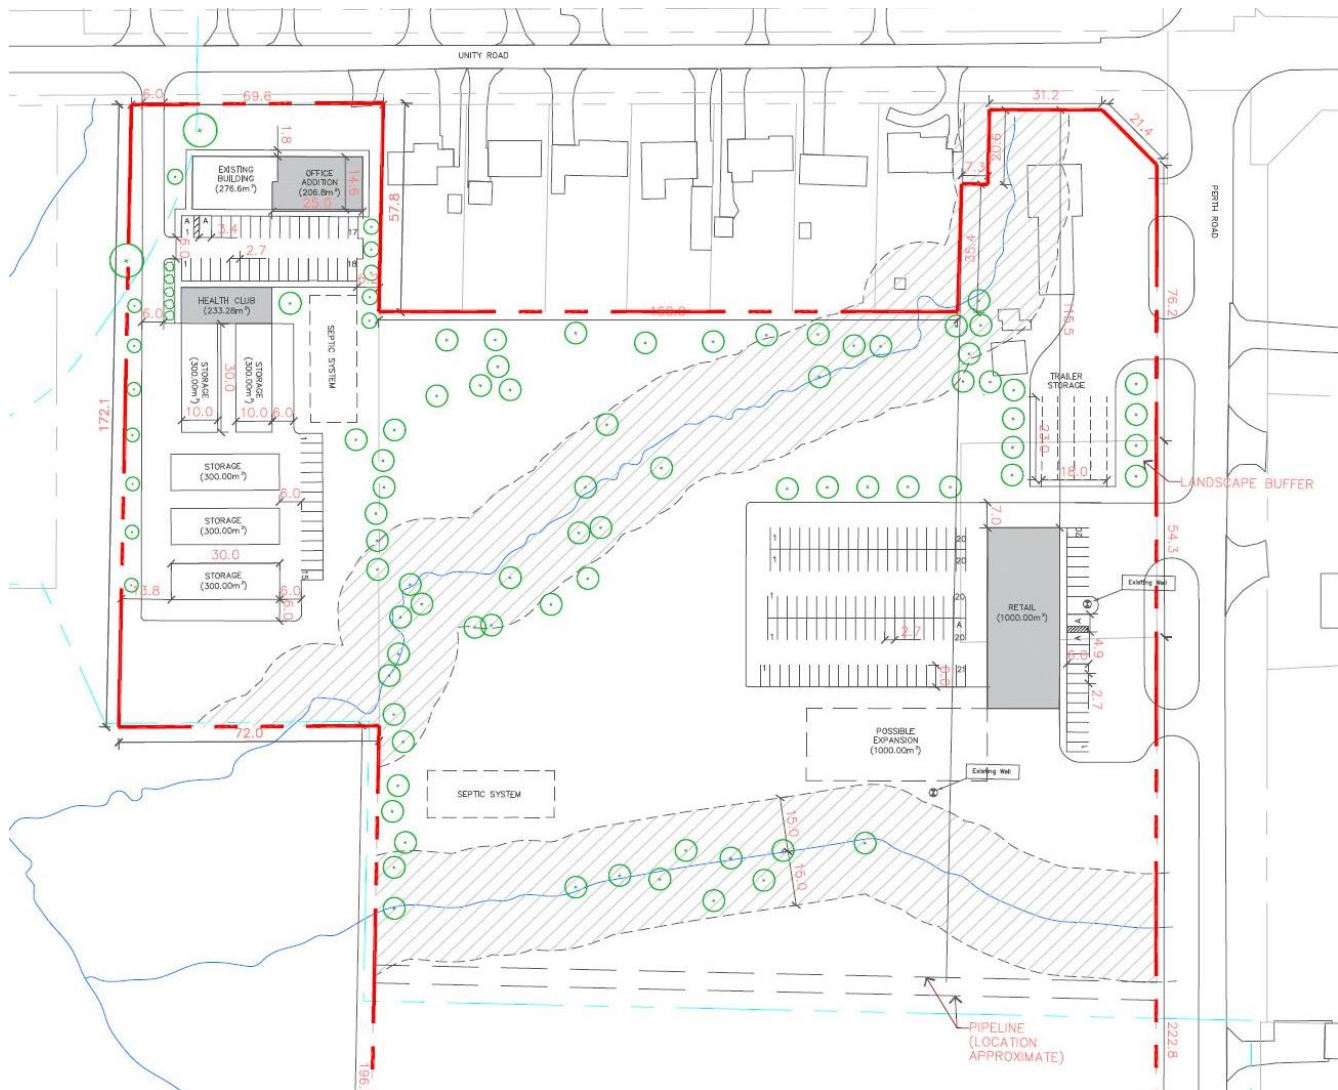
Conceptual Site Plan (Source: Fotenn Planning + Design)
